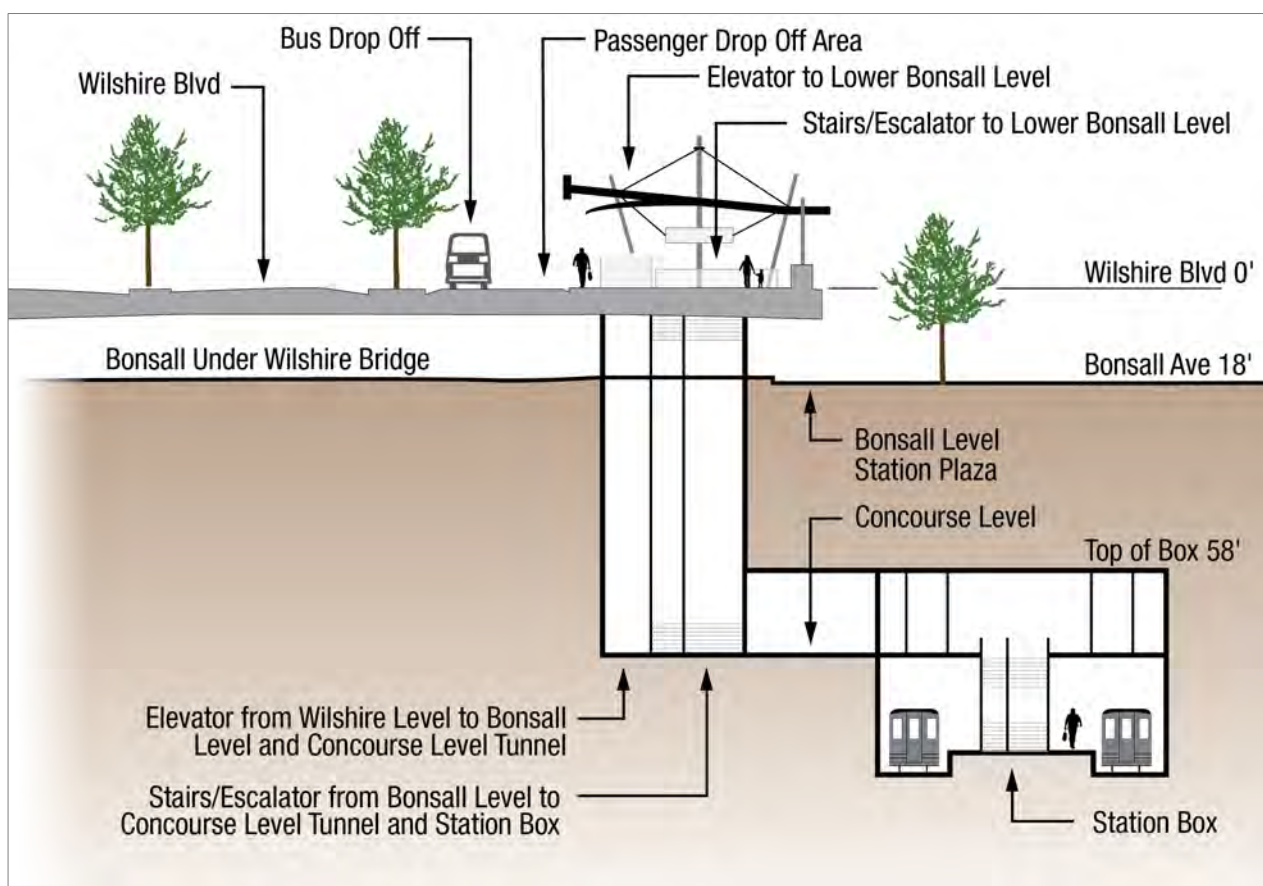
Westwood/VA Hospital North Station Cross-section
